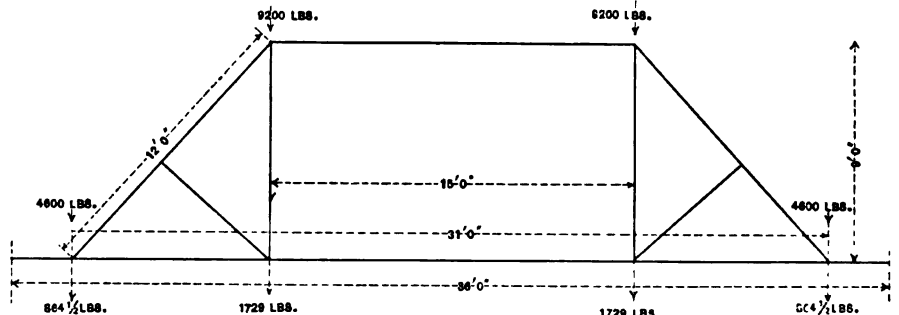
Diagram of Truss.—Scale, 1/8 In. to the Foot.
